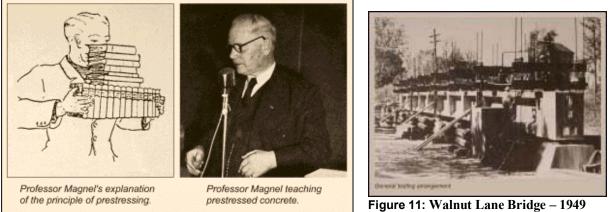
Walnut Lane Bridge – 1949 Philadelphia, PA USA
